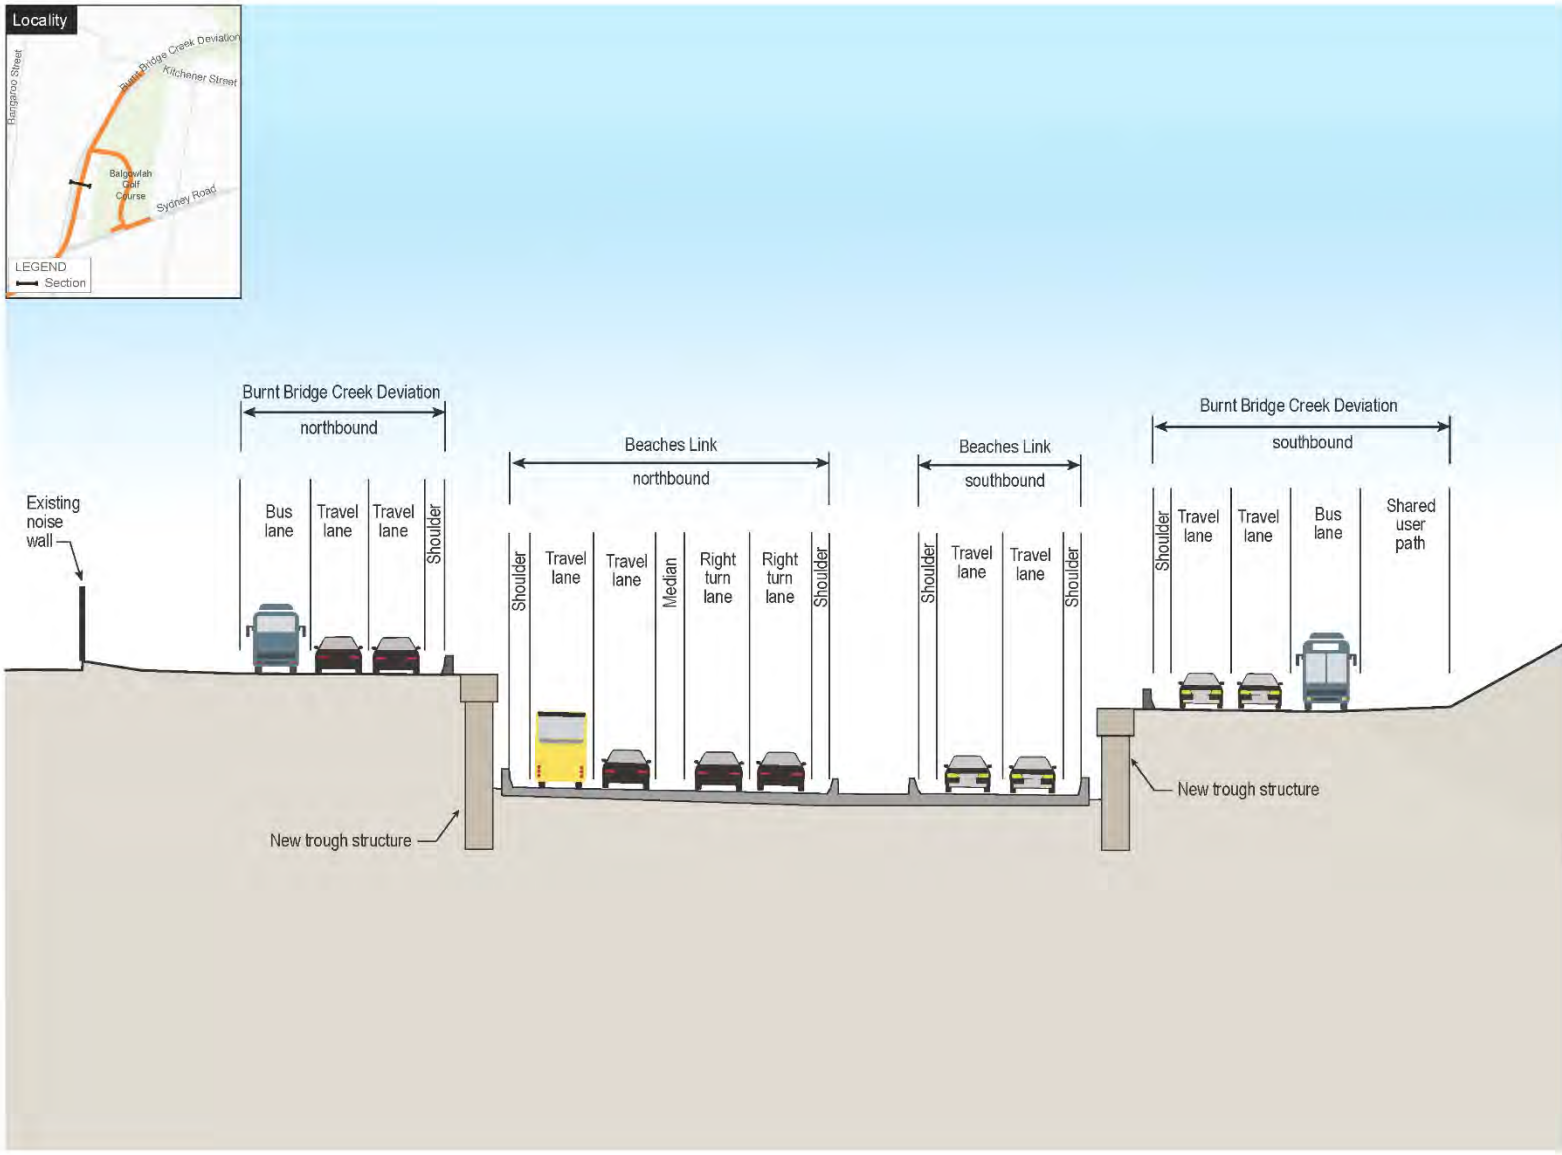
Indicative cross-section through the Burnt Bridge Creek Deviation and ramp trough structures
